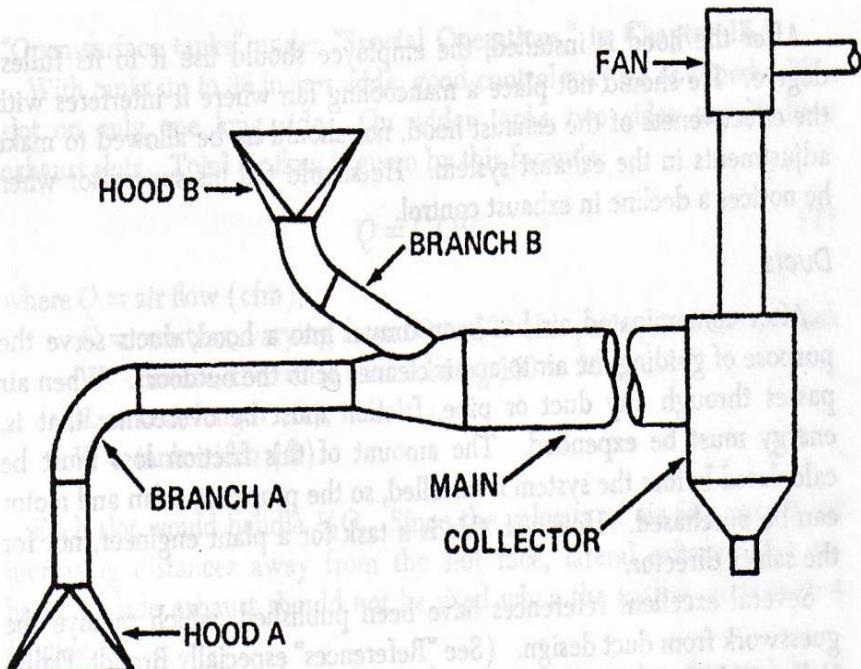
Typical local exhaust system: hood, duct, collector, and fan.
